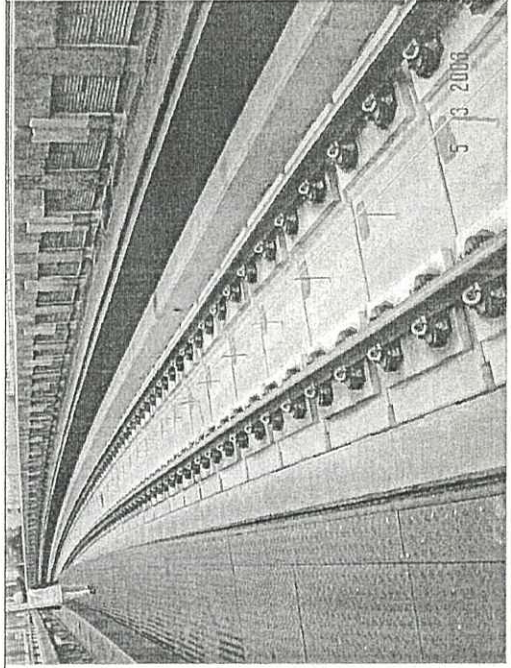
Rail Mounted on Baseplate of Floating Slab
